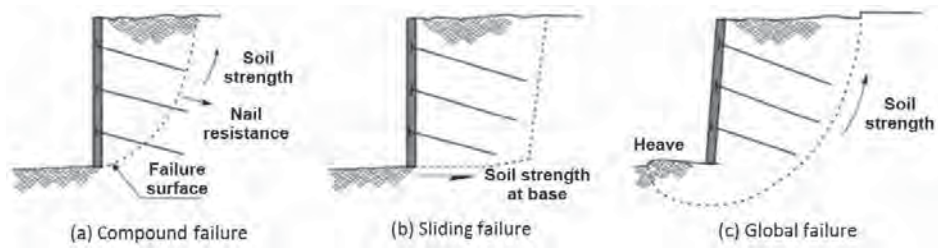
External failure modes of soil nailed walls (Lazarte et al., 2003).
